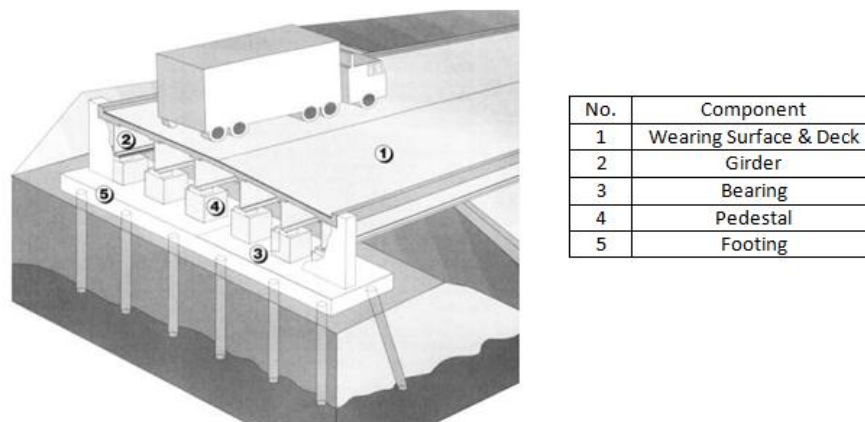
Structural components on typical bridge site (taken from Bridge Engineering, 2007)
